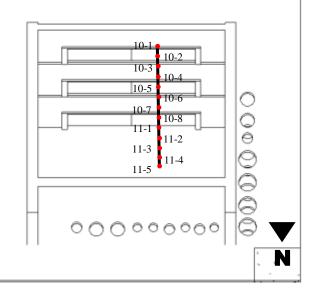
TC inside elevator shaft from 5th to 3rd floor
